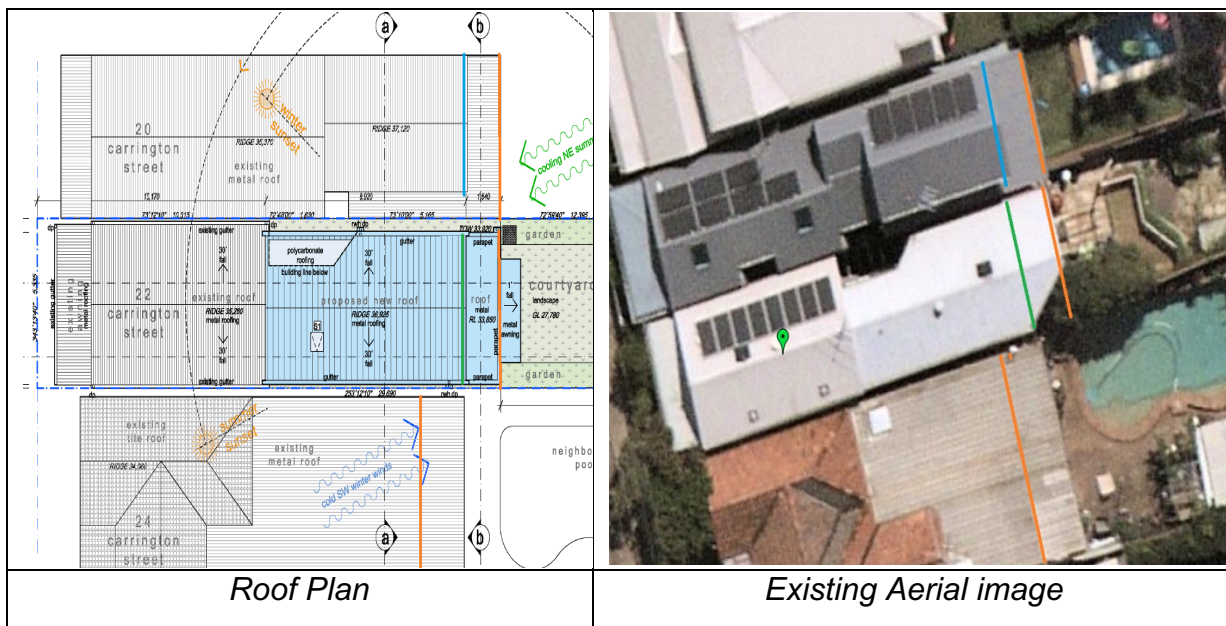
Proposed rear ground and first floor additions BLZ compared to adjoining properties.
